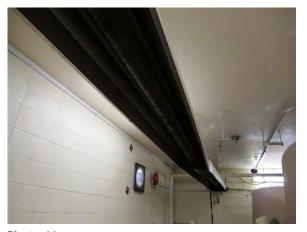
Damaged radiant heater in the old Curling Club refrigeration room
